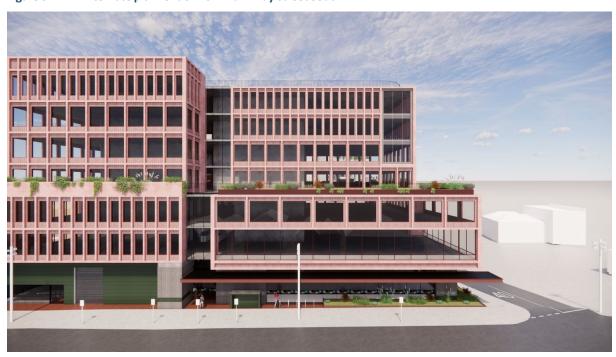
Alternate plan render from corner of Humffray Street South and Porter Street
